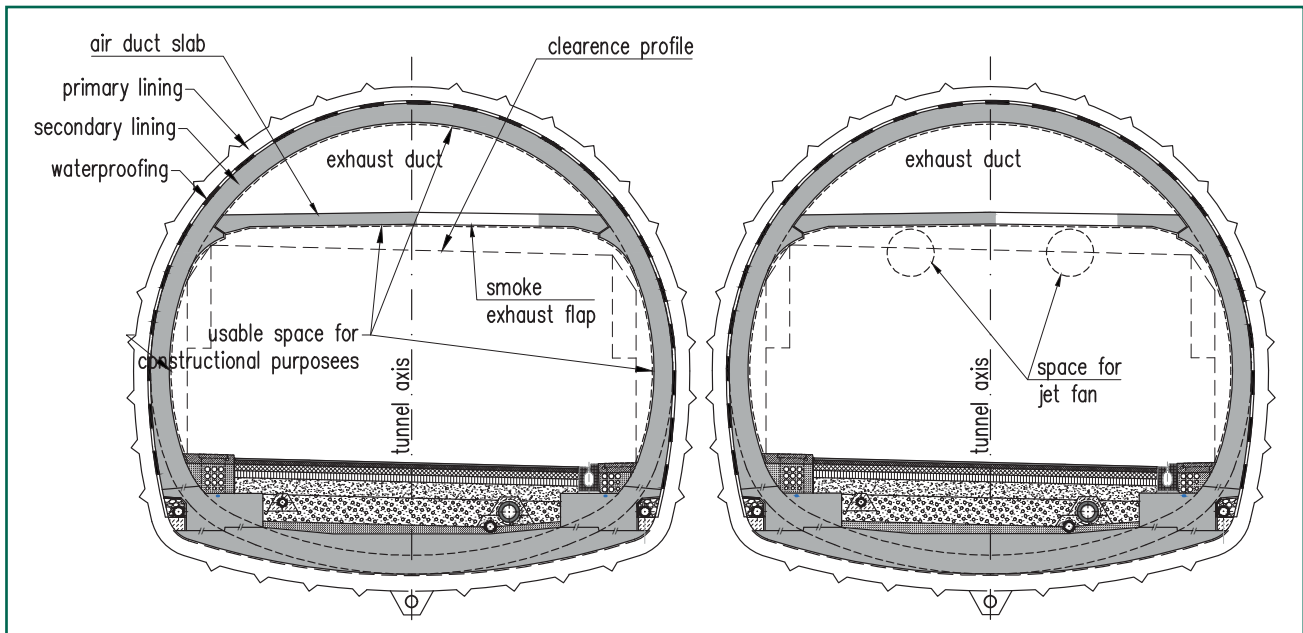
Structural usable space (left) and space for the installation of jet fans (right);
